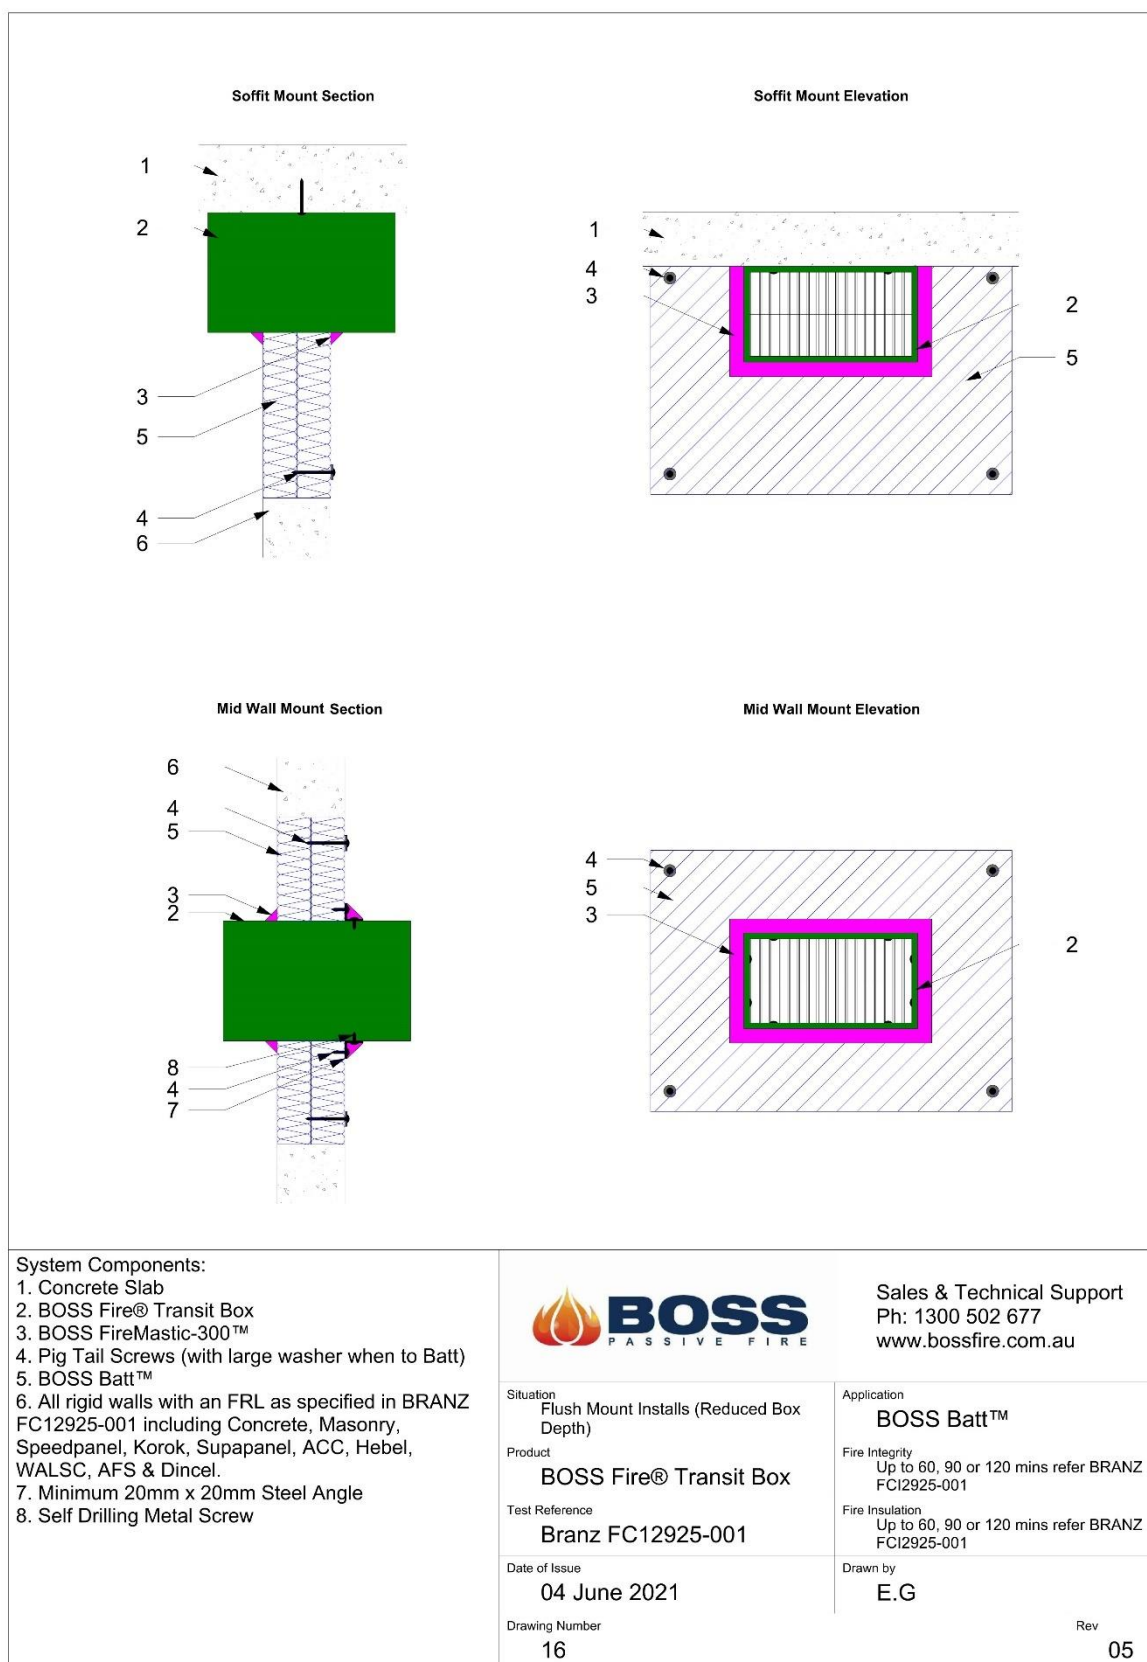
BOSS Fire® Transit Box – Installation in BOSS Batt Infill Panel. - Soffit Mount & Mid Wall Mount –Flexible Walls – 60, 90 & 120min FRL
